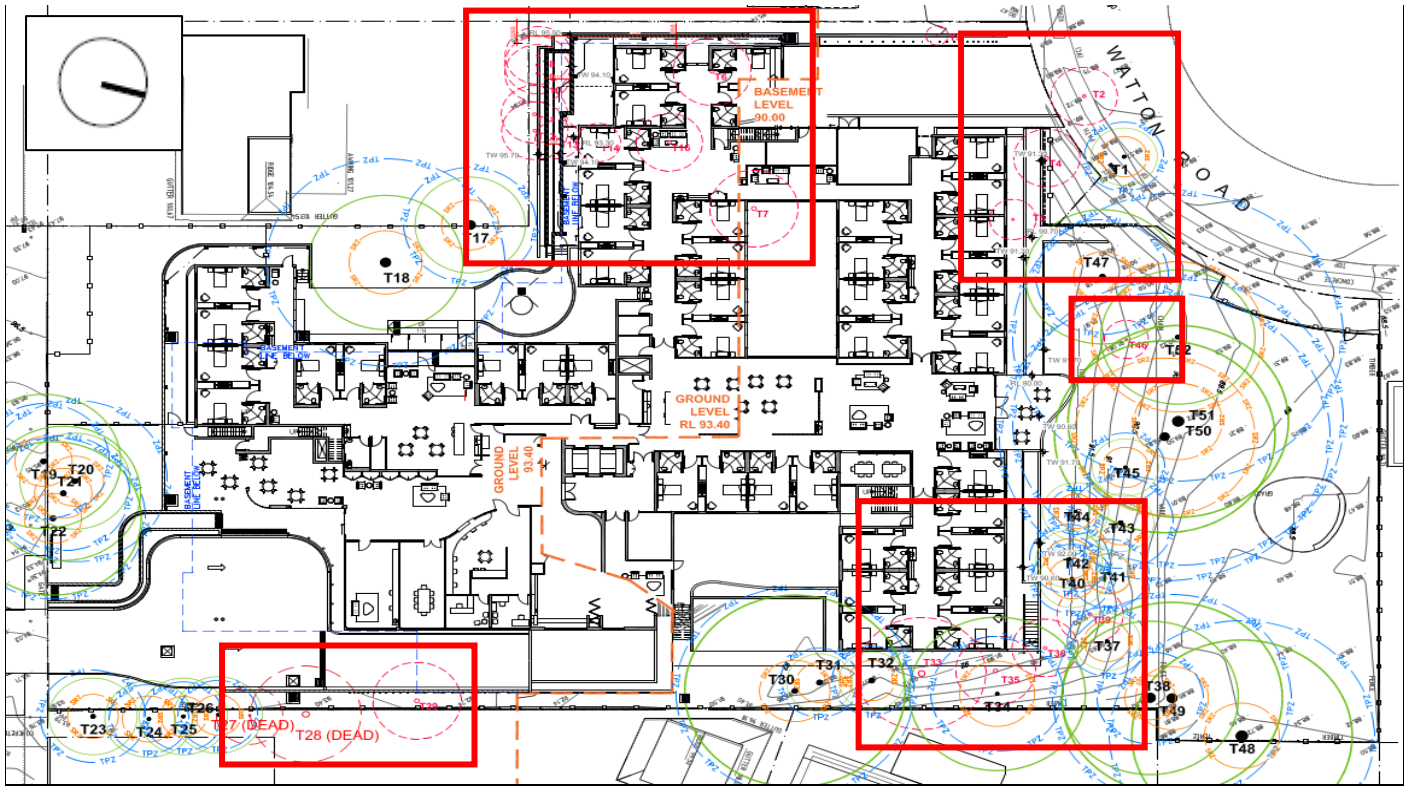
Tree Retention and Removal Plan. Trees proposed to be removed outlined in red. Source: TaylorBrammer
